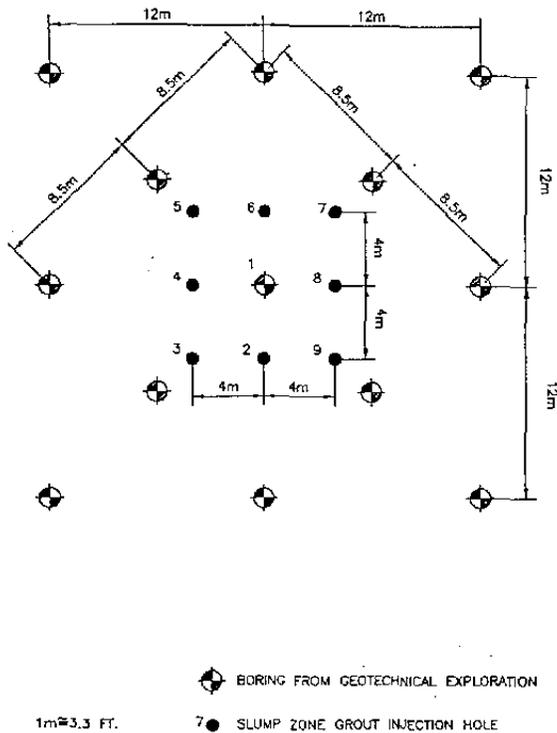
PLAN OF TYPICAL EXPLORATION BORING SPACING AND SLUMP ZONE GROUTING PATTERN.
